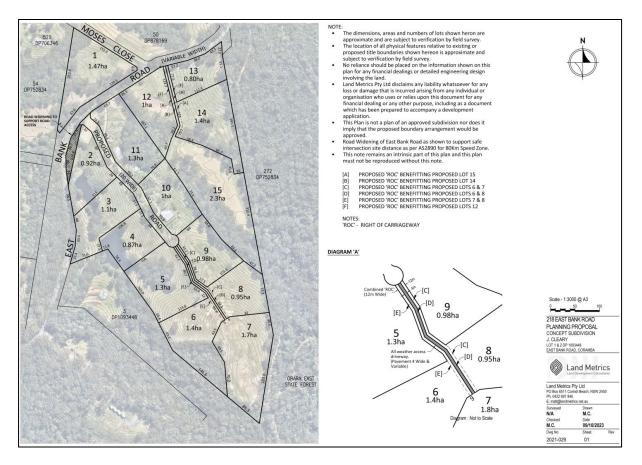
Site Layout by Land Metrics (09/10/2023)
